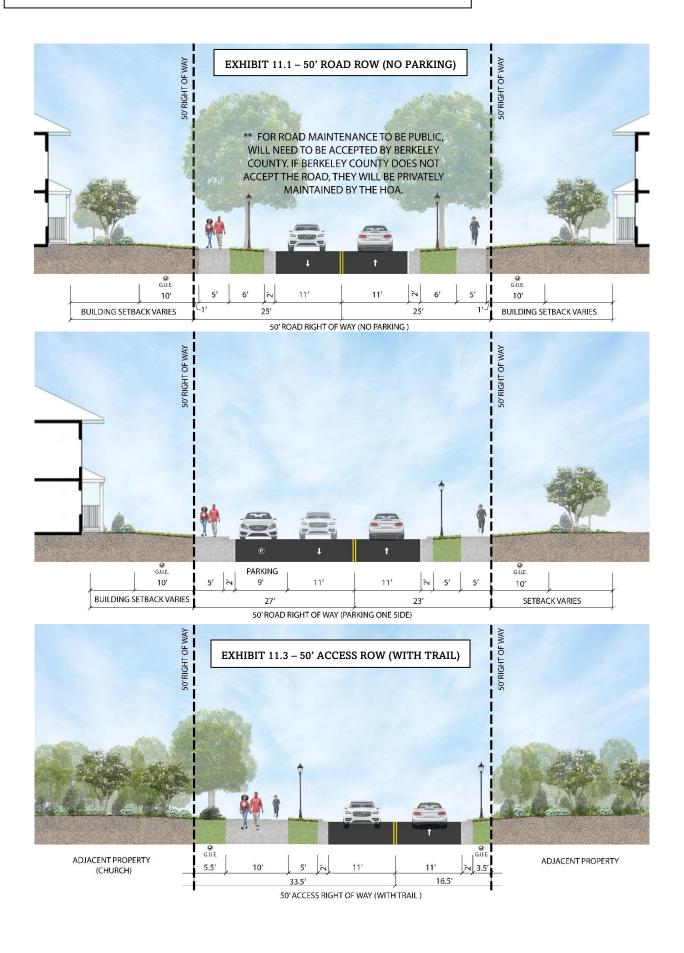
TYPICAL NEIGHBORHOOD ROAD SECTIONS
